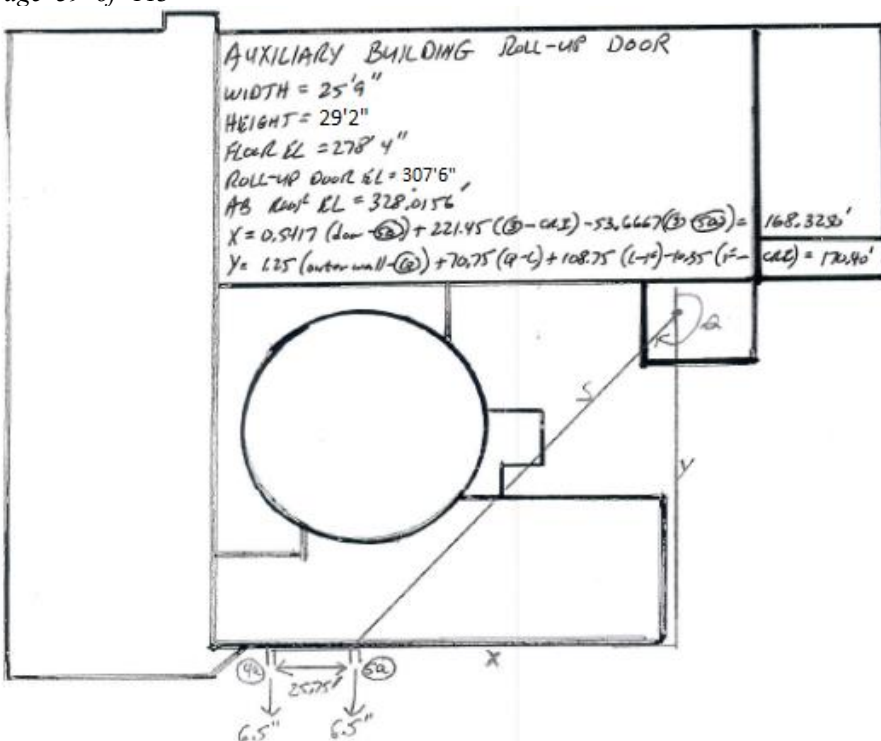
Auxiliary Building Roll-Up Door (Point Source) to Control Room Inlet
